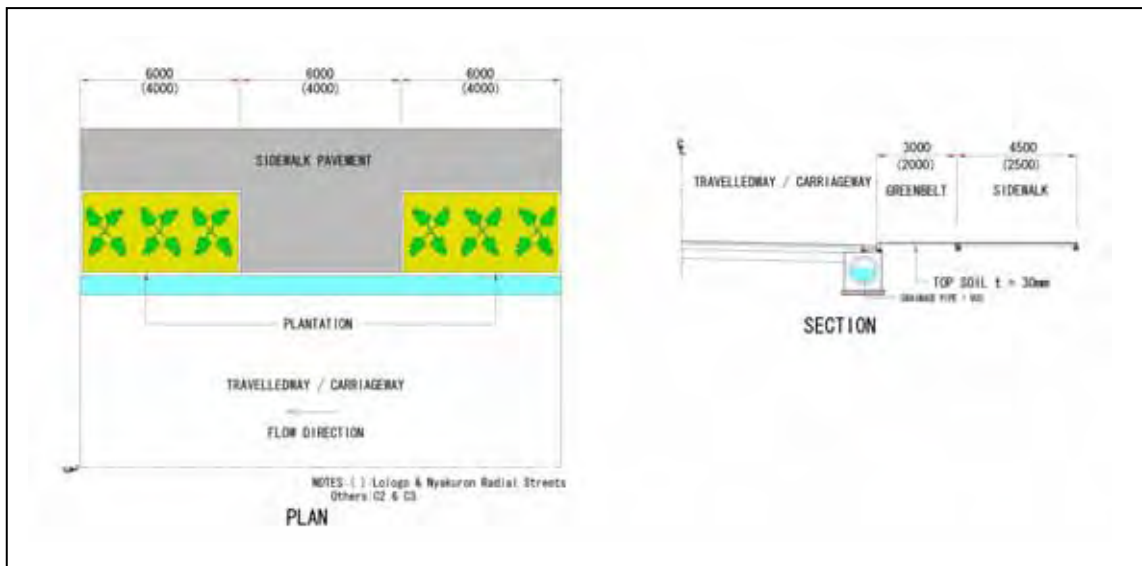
General Plan of Green Belt and Sidewalk
